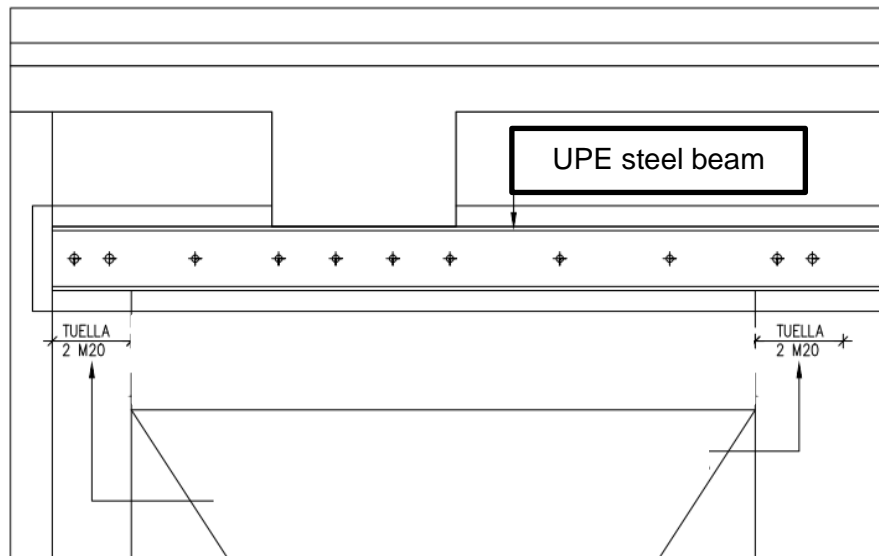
Example of strengthening of an opening in a bearing wall with steel beam.
